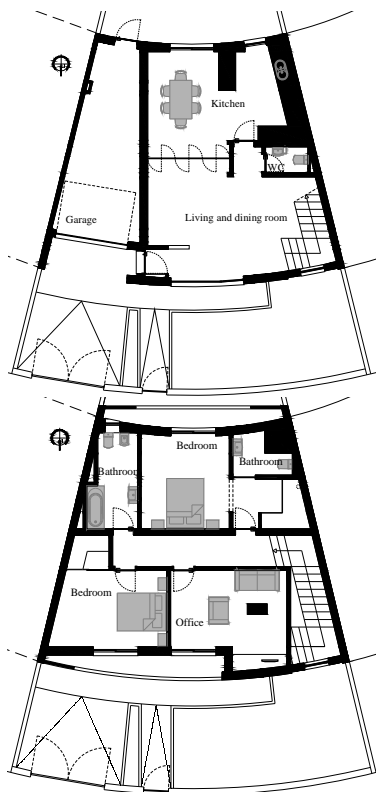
Schematic plan of the 1st and 2nd floor of the single family attached building studied
